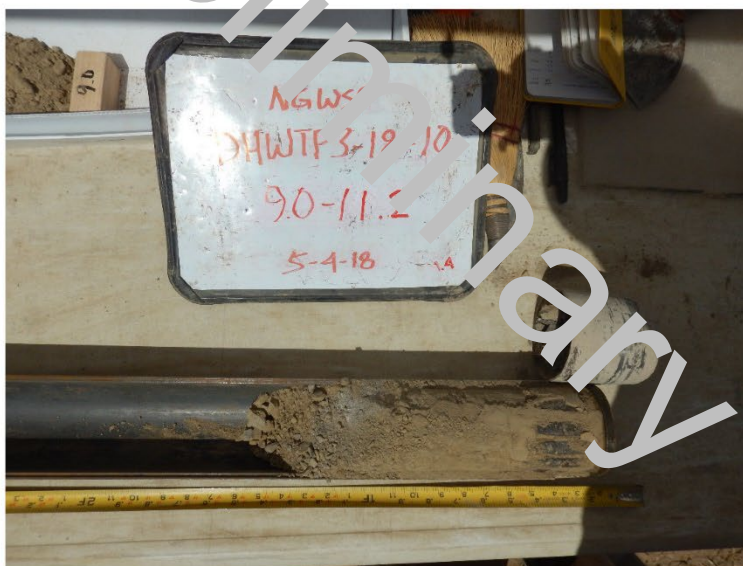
/4/2018 NGWSP, SJWTP, DHWTP3-18-10 (9.0-11.2 feet). Photo By: P. Gardner
